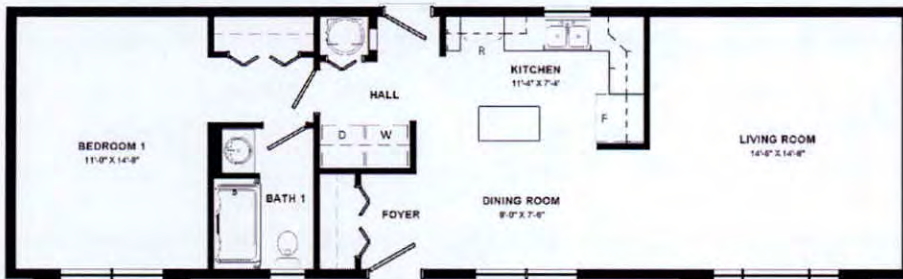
A typical floor plan of a single section home. Single section manufactured homes are structurally complete when they leave the factory. © Kent Homes (2019).
